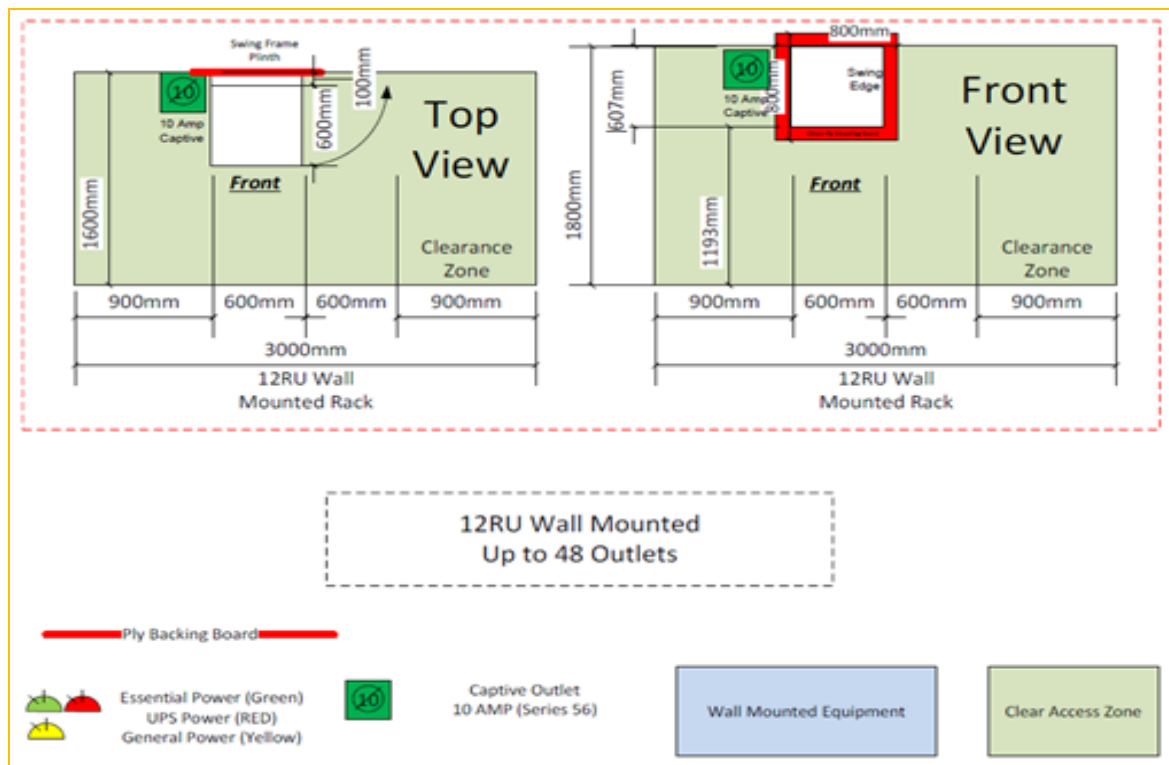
TR – 12RU wall mounted up to 48 outlets of usable floor space
